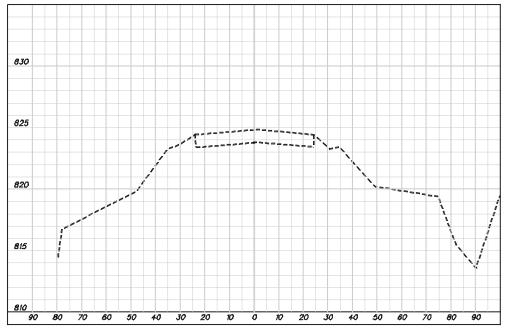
Cross-Section, 31st Street 450' West of Louisiana, Looking East
